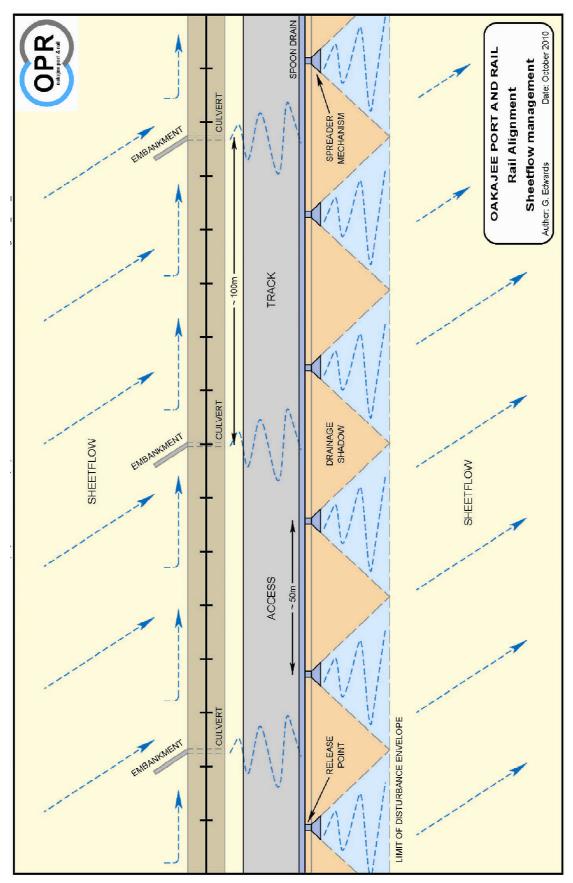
Design of proposed Rail Corridor drainage facilities (Astron 2010)
